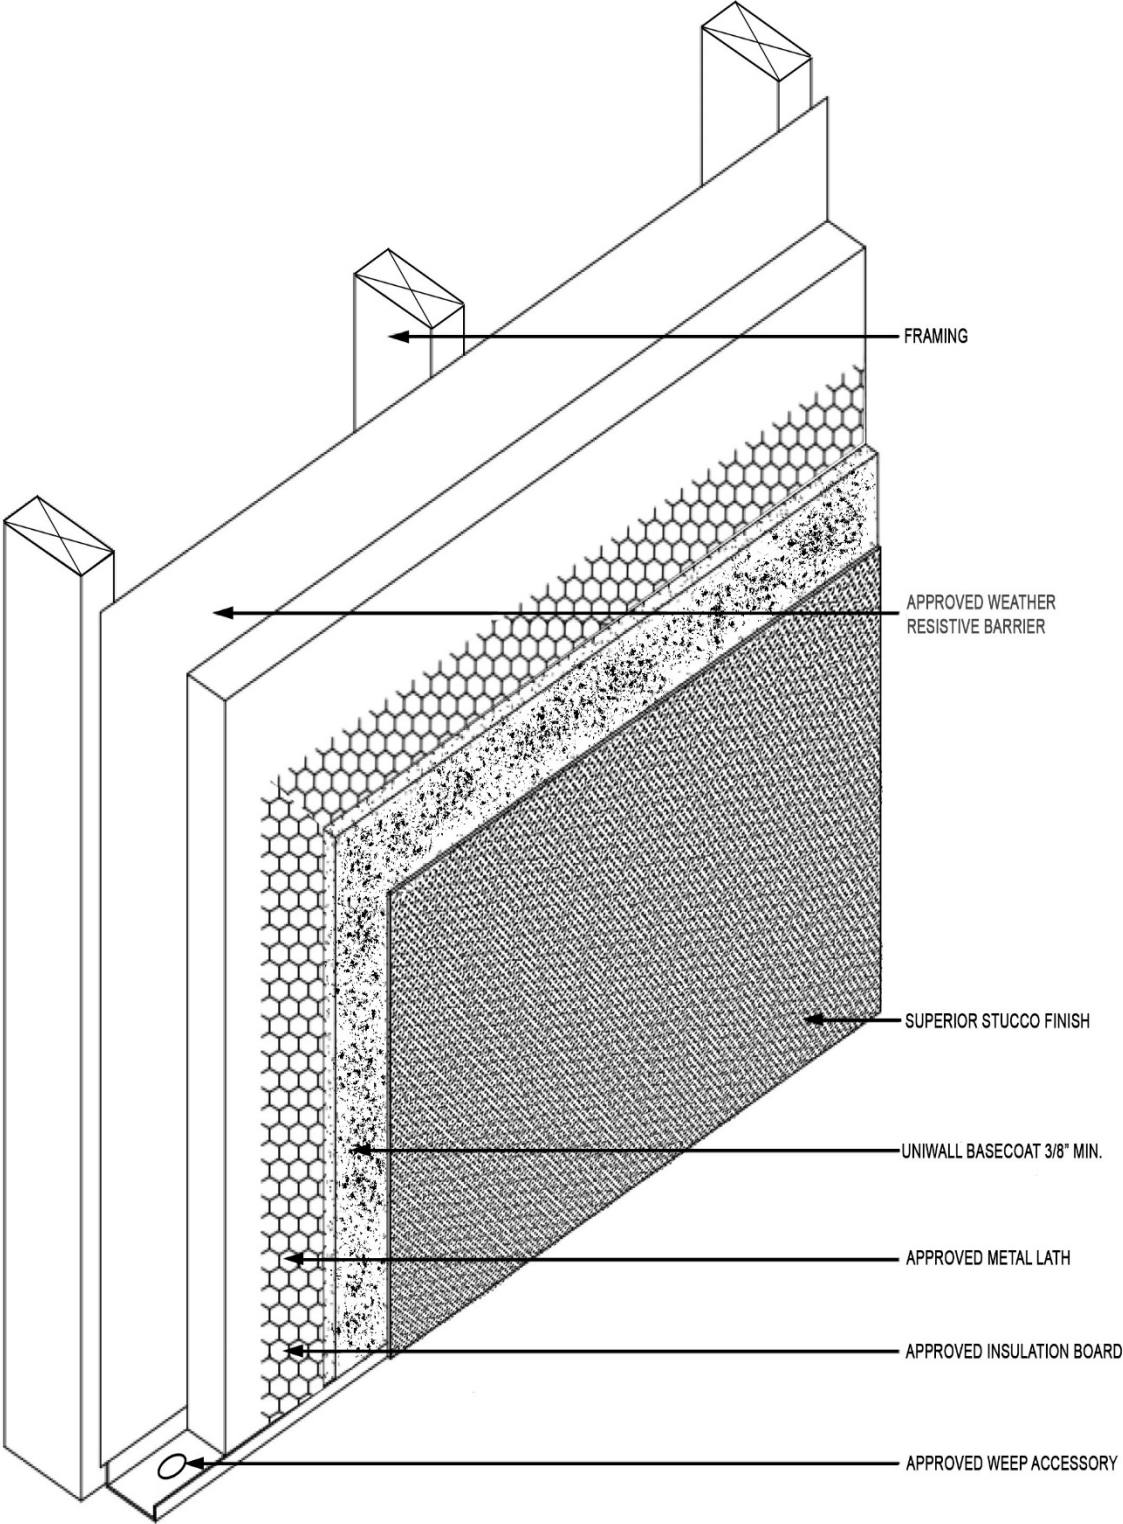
TYPICAL WALL CONSTRUCTION
